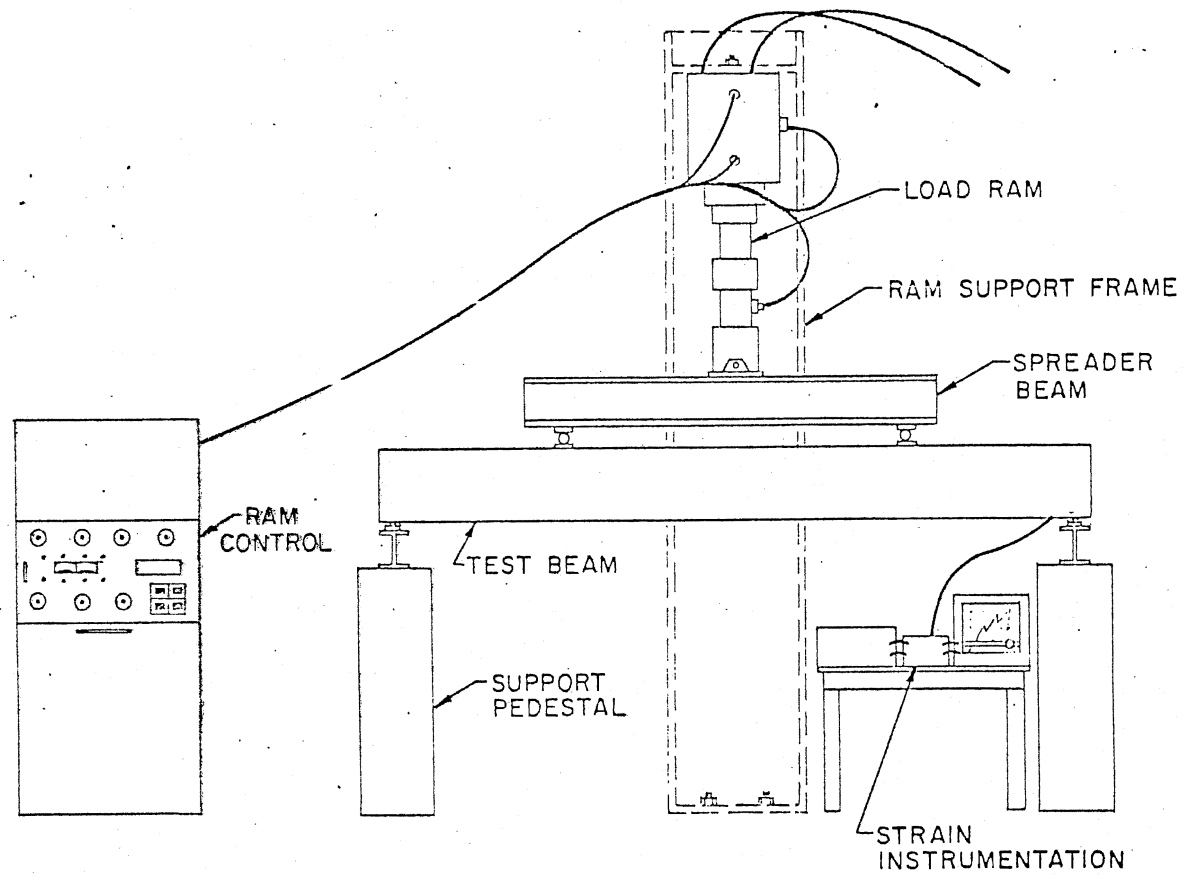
Beam Installed in Laboratory Test Fixture for Preliminary Static Load Tests
